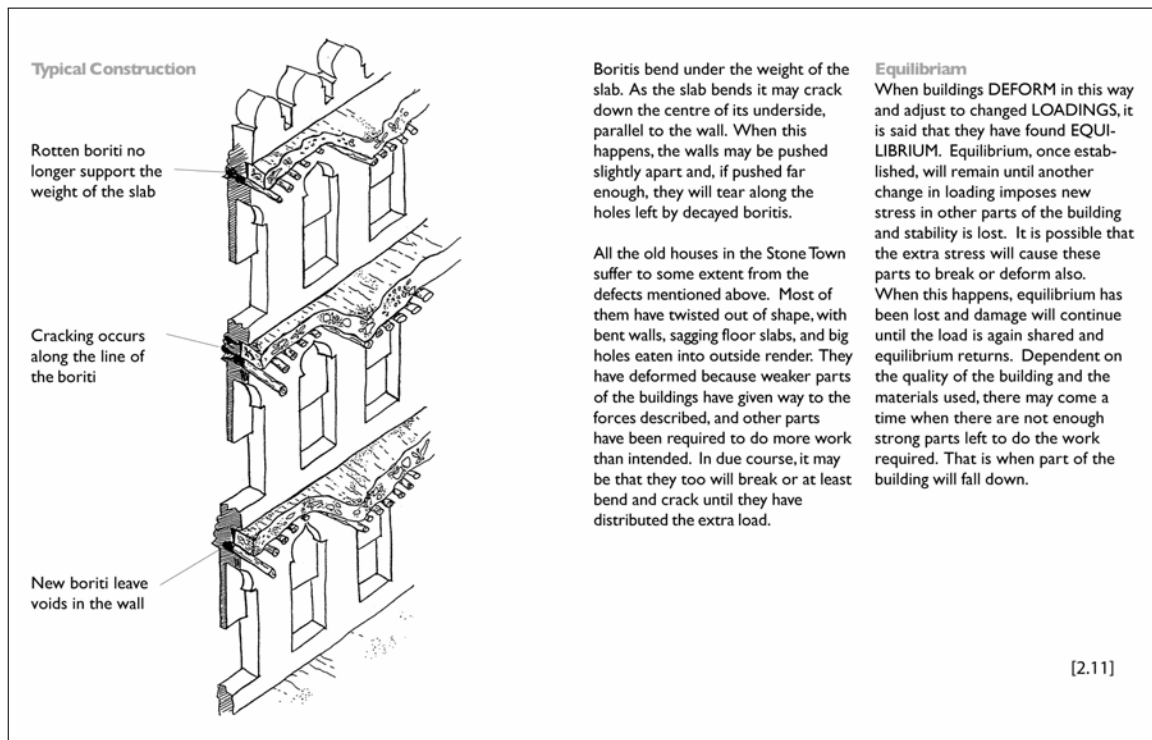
Conservation and Design Guidelines for Zanzibar Stone Town. Roof and floor slabs. Tab 2.11. [Battle and Steel, 2001.]
